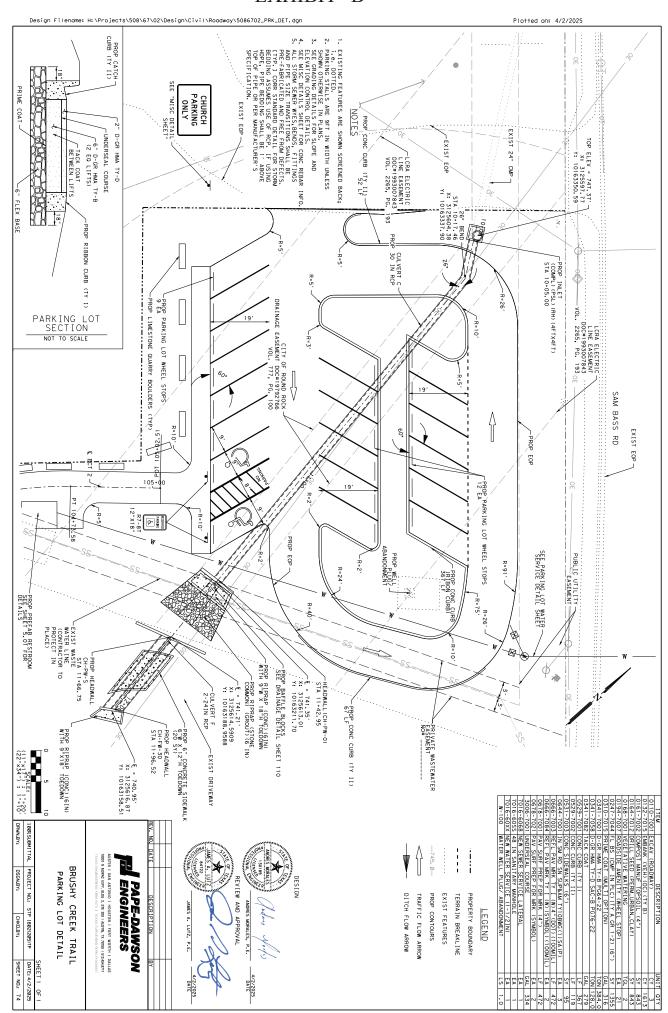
EXHIBIT "B"	CULVERT	RECONSTR	RUCTION	PLANS
